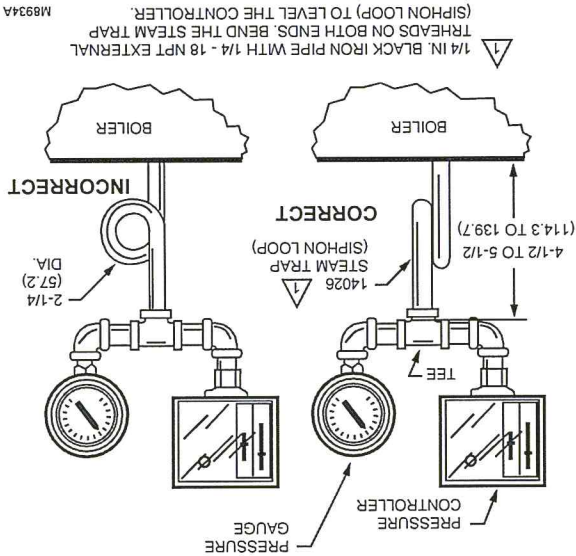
Right and wrong mounting of a steam trap (siphon loop), with approximate dimensions in in. (mm).
